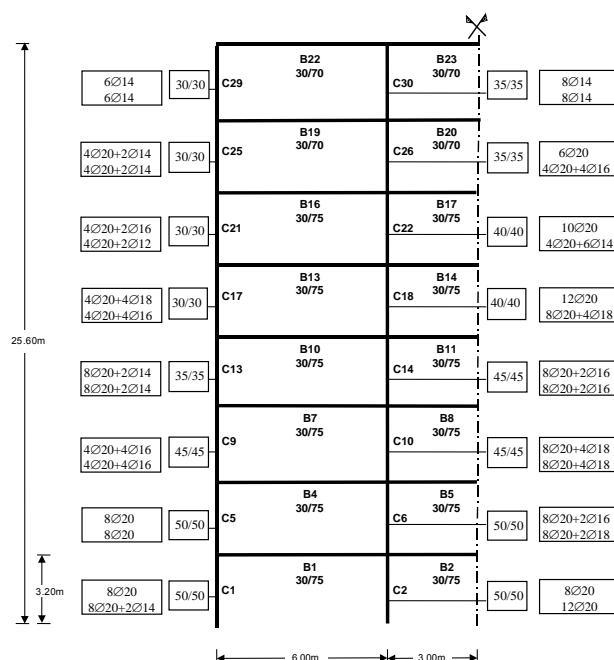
Structural system and column reinforcement of the 8-storey frame structure.
